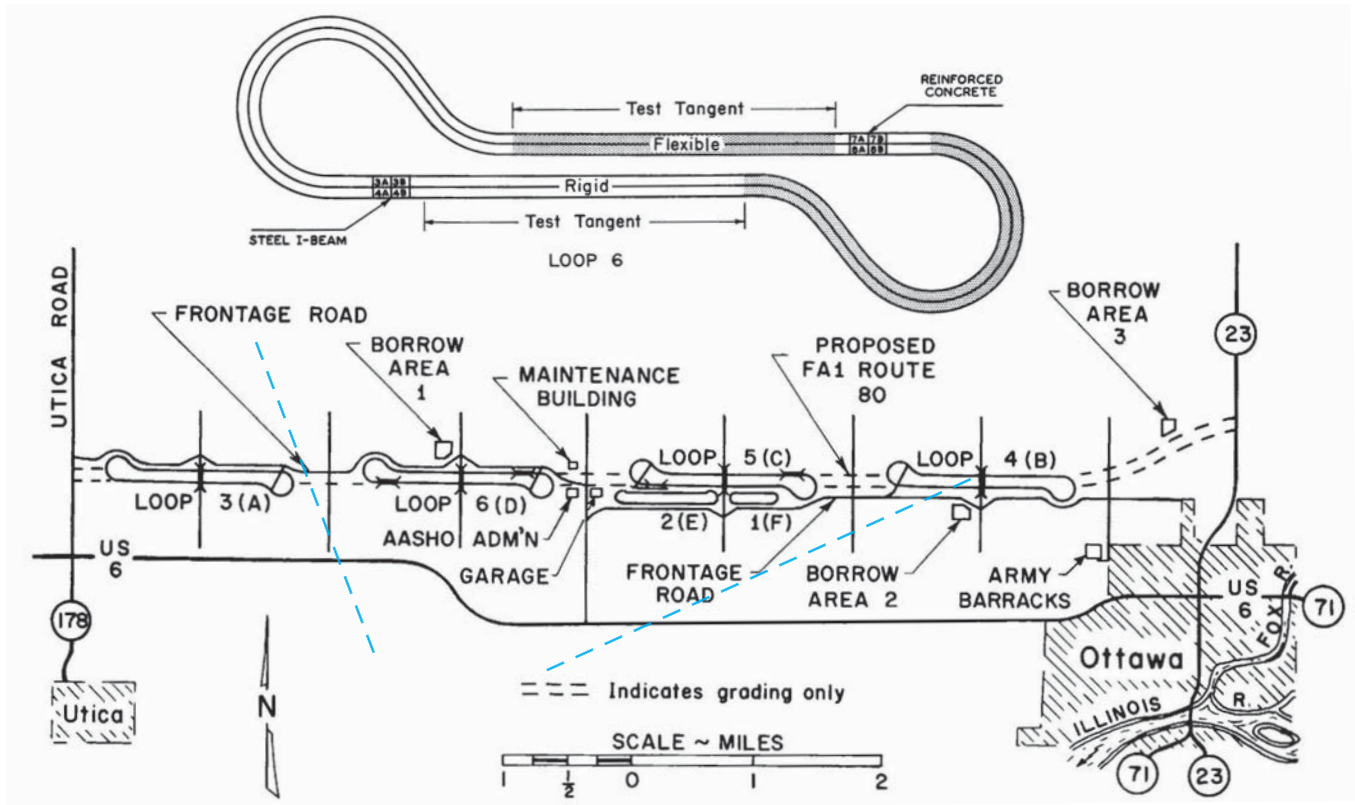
Layout of test loops at AASHO Road Test (2).
